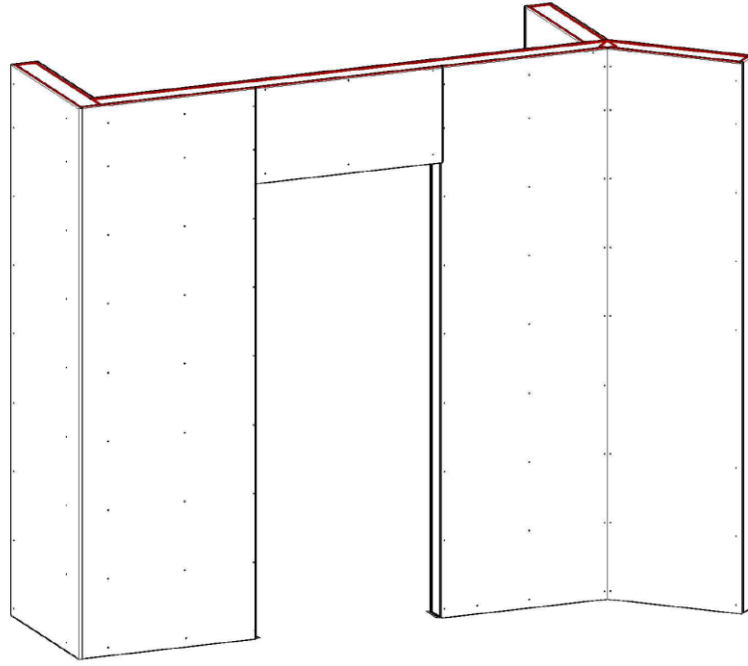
Perspective view of flexible track doorway specimen (Test ID A3) configuration.
